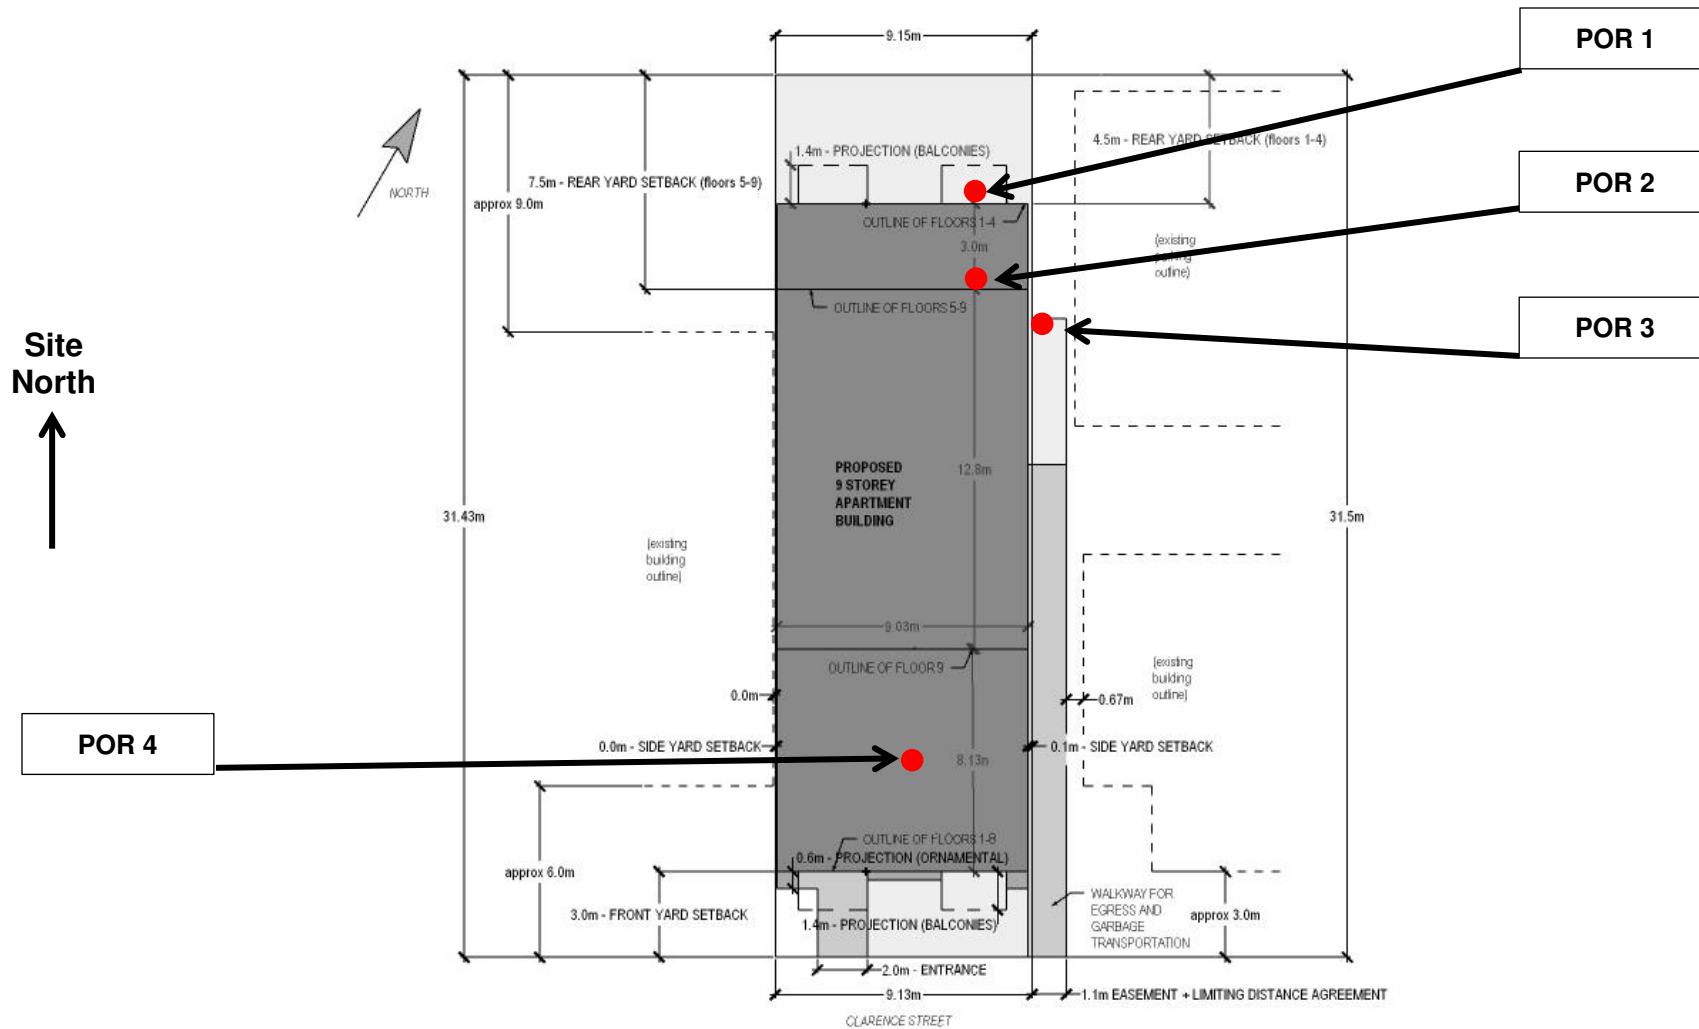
Building Floor Plans showing Points of Reception (Source: Art House Developments)
